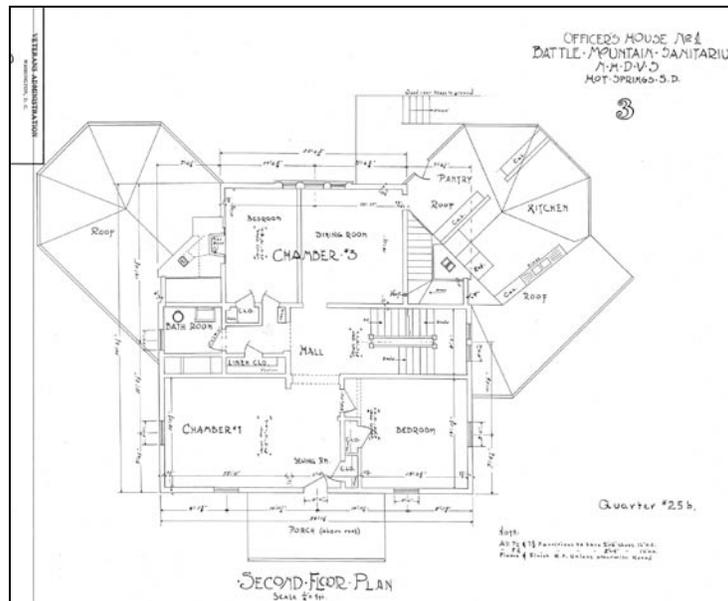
Second Floor Plan, "Officer's House No. 1/Quarter 25B"
